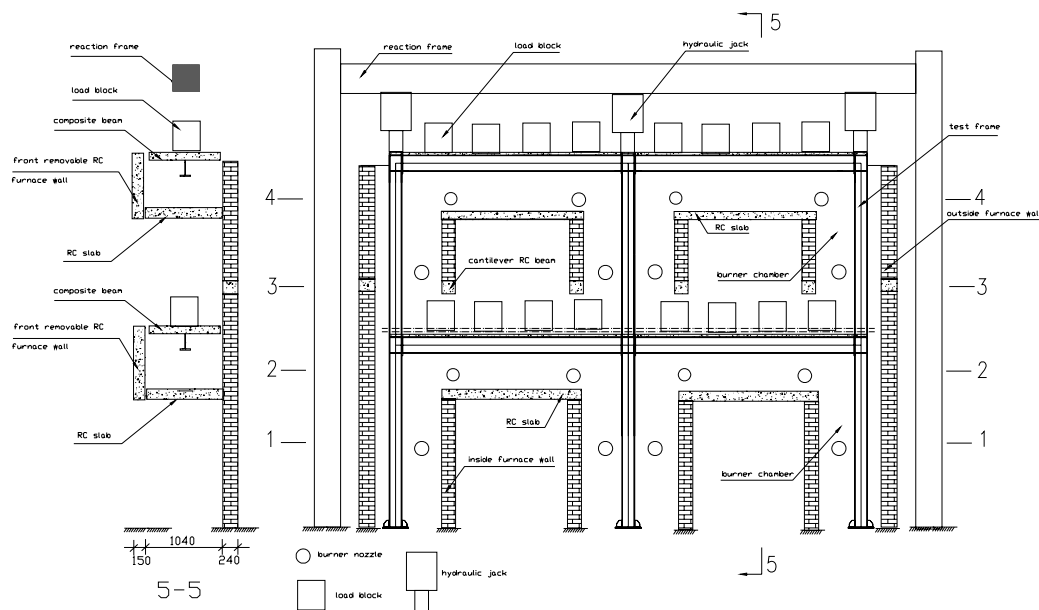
Elevation of the furnace test setup indicating the inner and outer furnace walls, reaction frame, load blocks and burners. A sectional side view at section 5-5 has also been shown (left sub-figure).
